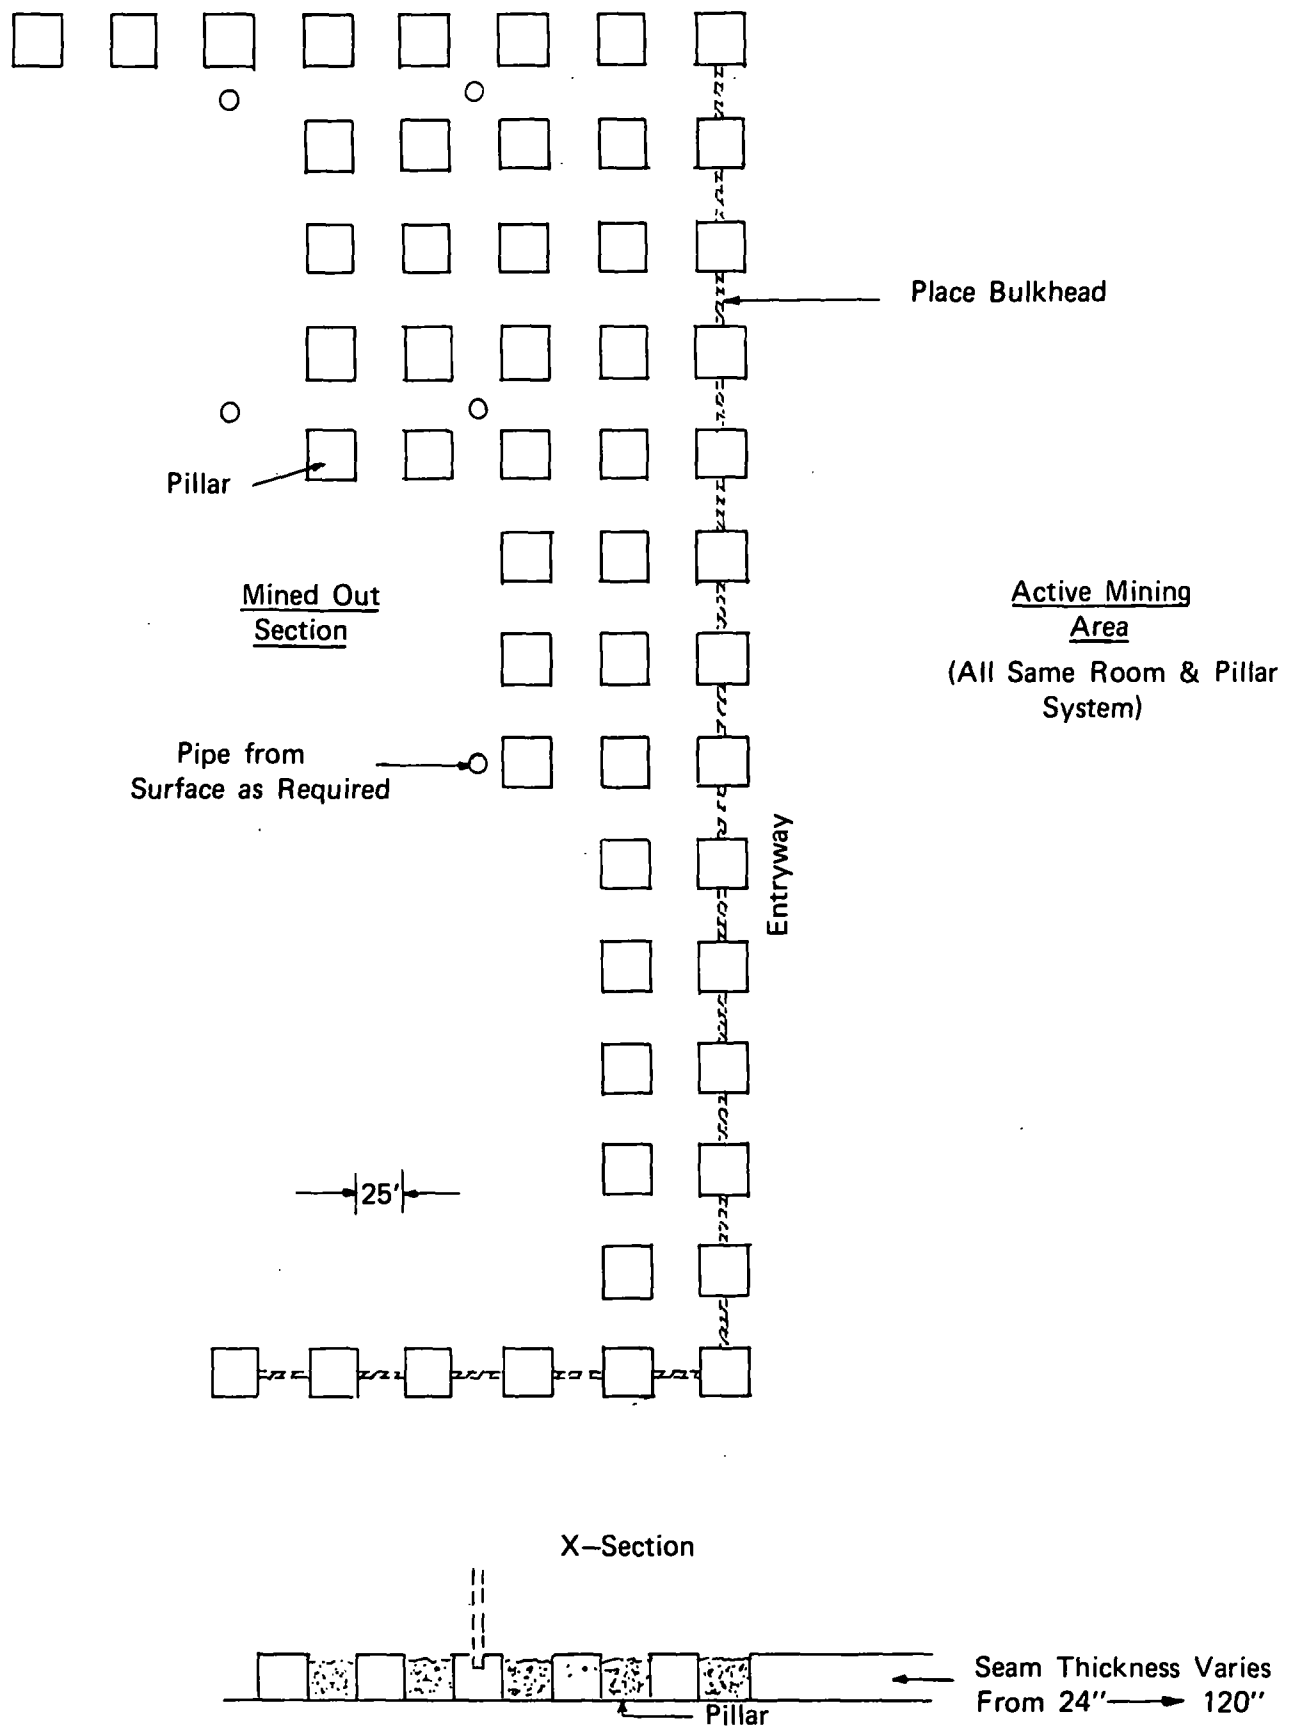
PLAN - ROOM AND PILLAR MINE
